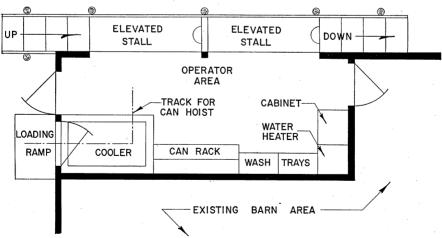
The unit is designed so that it can be built in the corner of an existing barn or shed to reduce building cost.
